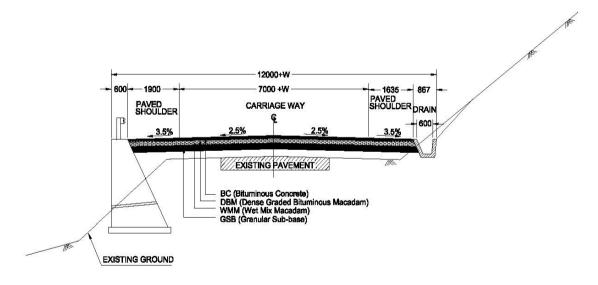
(2): Typical Cross Section for Widening Primarily to Valley Side
